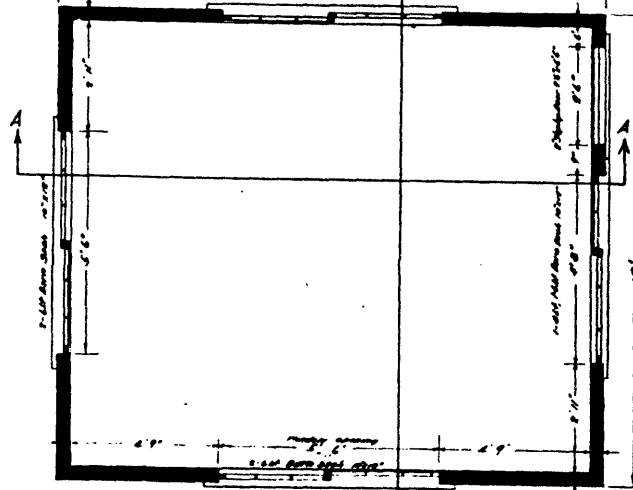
(2 sheets). Frame lookout house, Plan L-2, 1928,
